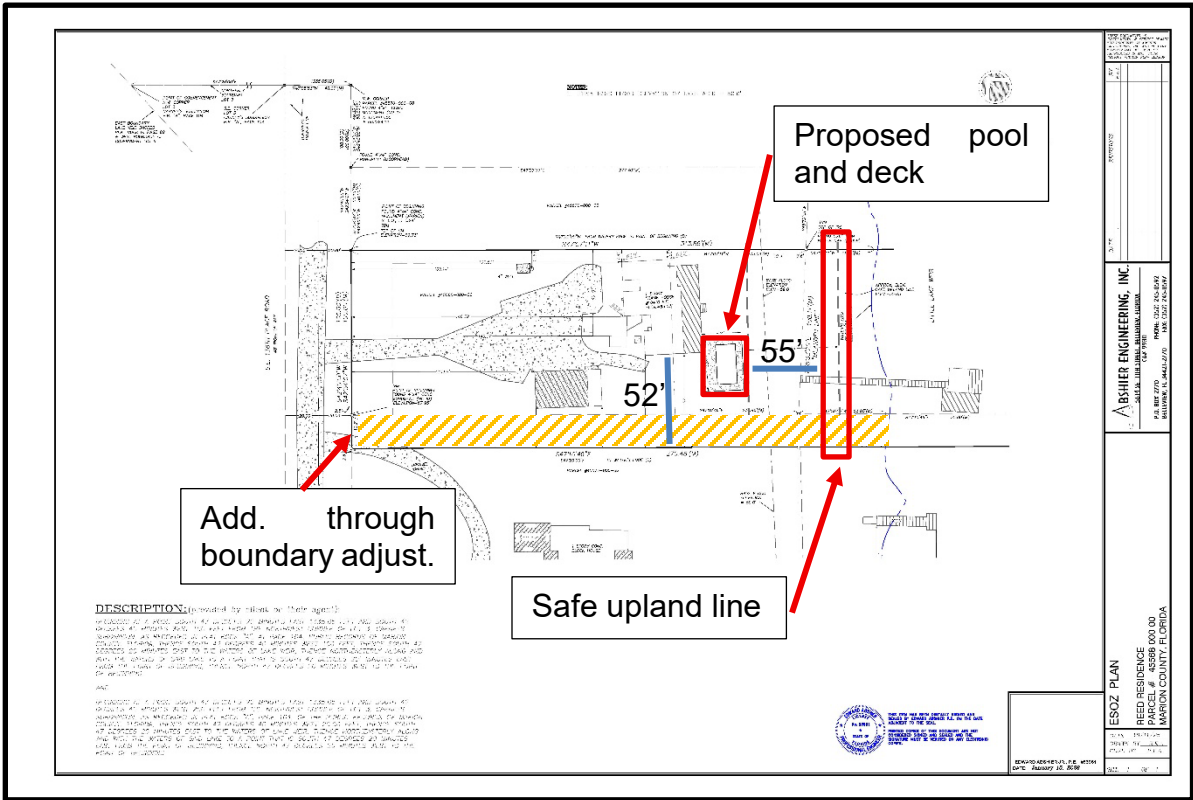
is a general location aerial displaying existing site conditions and Figure 2 provides the submitted ESOZ plan for the proposed pool and deck. The submitted ESOZ plan indicates the location of the existing single-family residence, accessory structure, well, driveway, and dock. The pool and deck are approximately 770 square feet in size and fifty-five (55) feet from the "safe upland line." Within the Lake Weir ESOZ, the waterfront property boundary is considered the front of the subject property for setback purposes. Although accessory structures are typically prohibited along the front yard of properties, pools and screen enclosures are explicitly allowed, provided minimum setbacks of seventy-five (75) feet are observed, pursuant to LDC Section 5.2.4.A.
